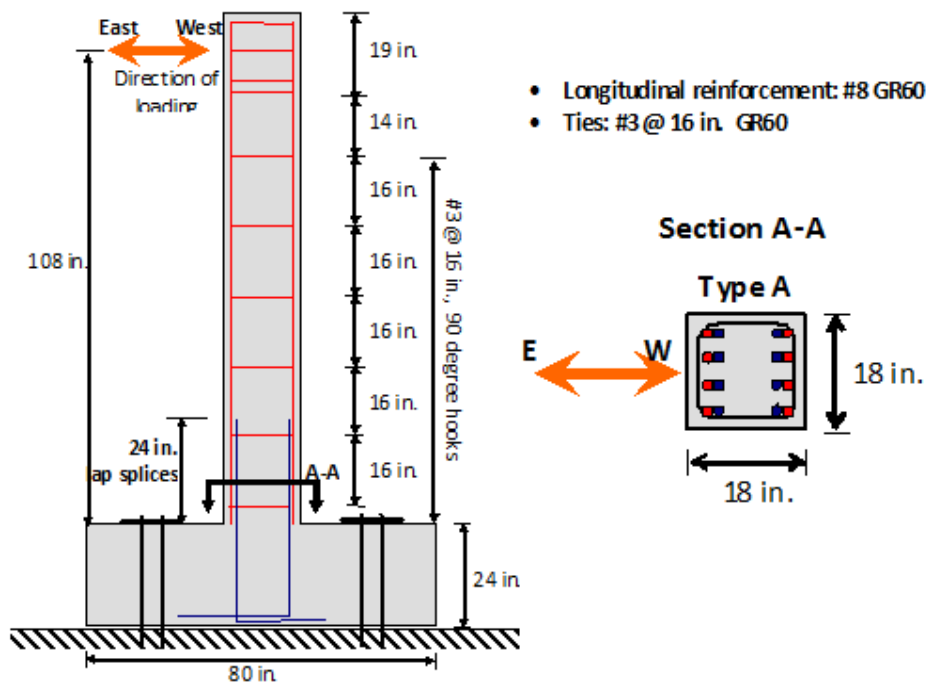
Elevation and plan view of the column previous to the retrofit. Lap Splices are shown. (Kim, 2008)
